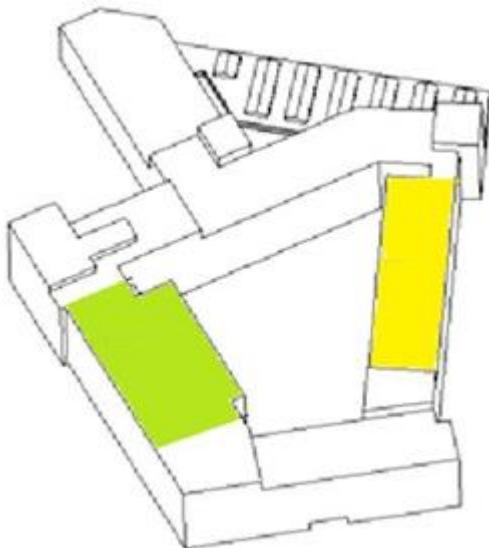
Ceiling area for PCM insulation (green) and external roof insulation (yellow).
